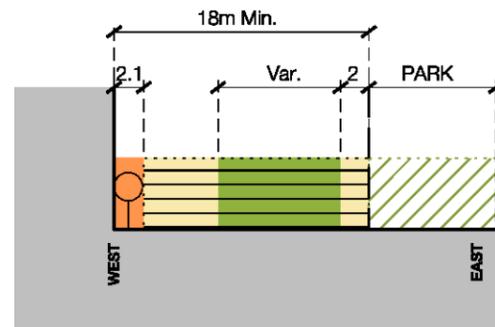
Street coding section: between Plot H and the Cambridge Grove Gardens.
